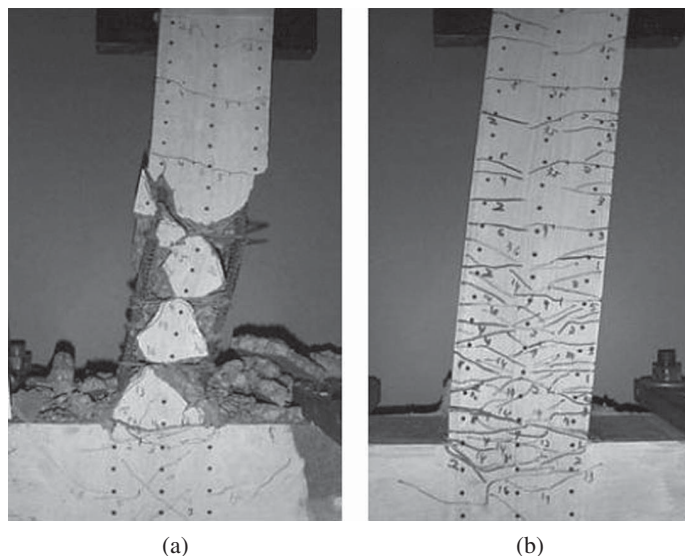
Damage of column at 10% drift after reverse cyclic loading (a) RCC (b) ECC without stirrups
